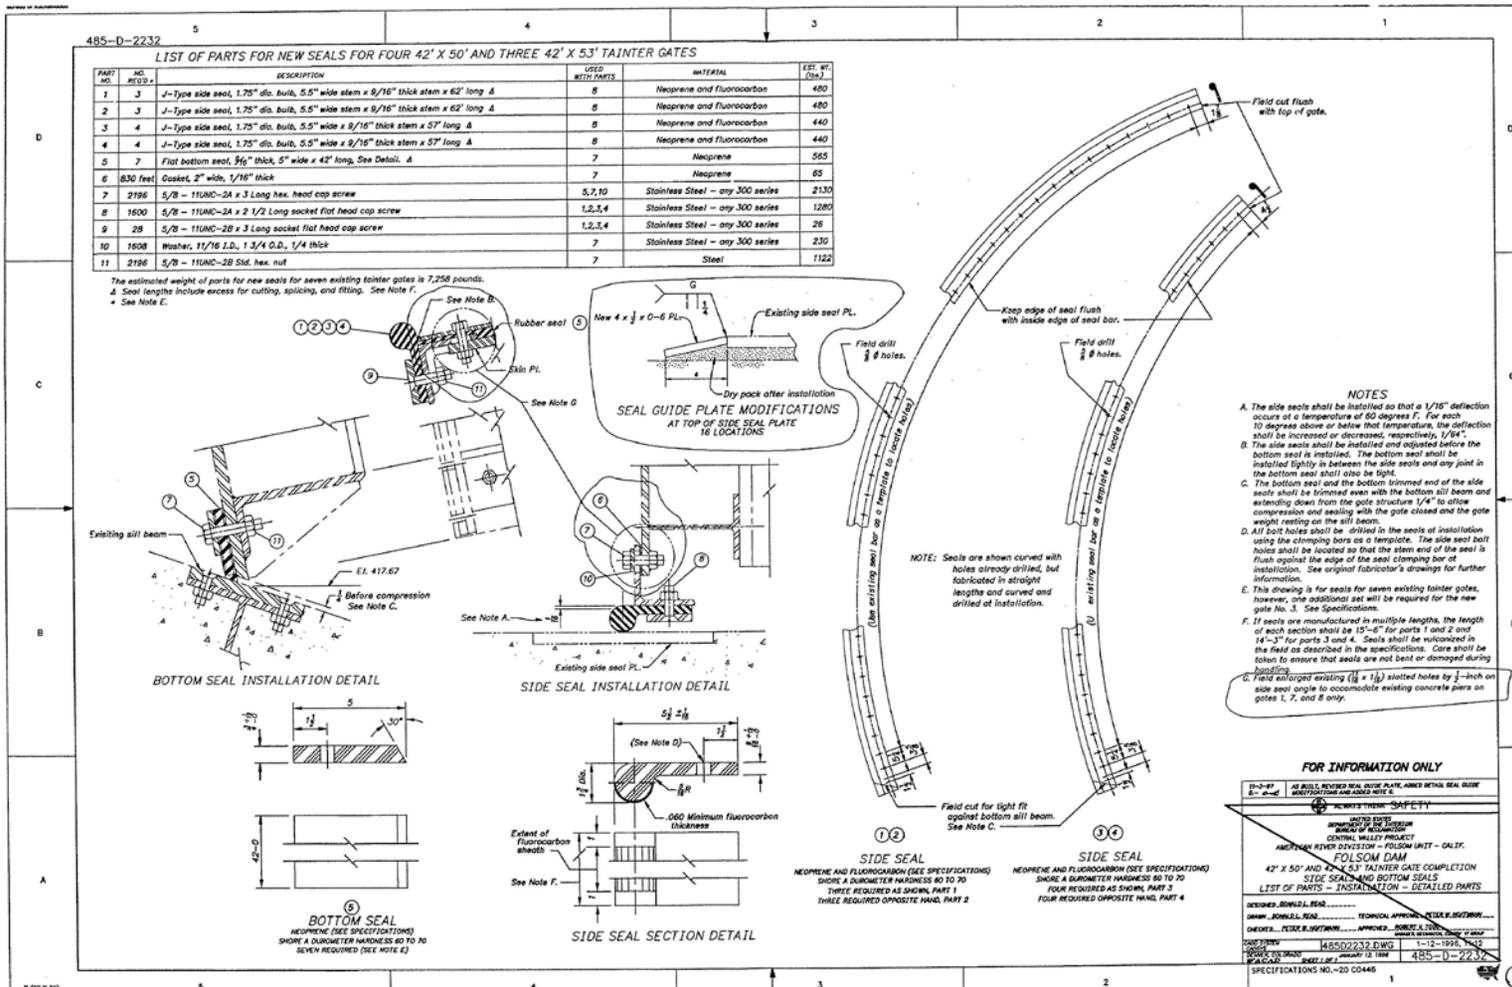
Reclamation drawing 485-D-2232 used for gate lip geometry shown in the Bottom Seal Installation Detail.
